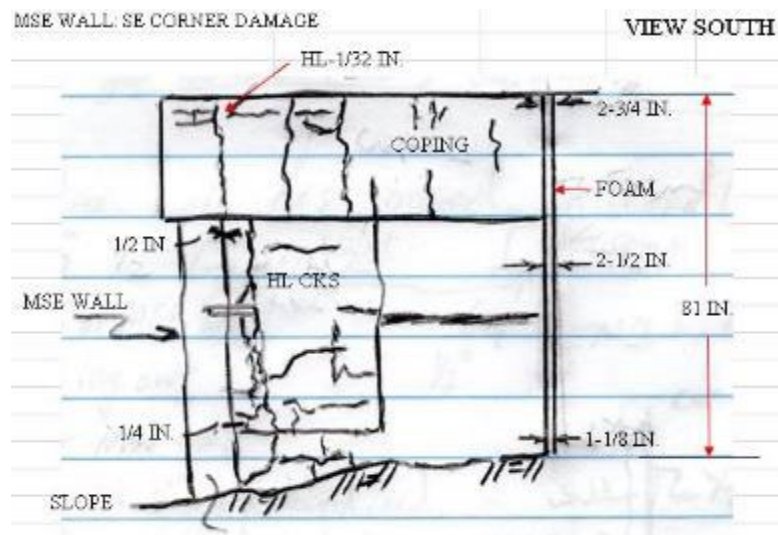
Map of Lateral Displacement Damage at North End of South MSE Wall, Bitch Creek Bridge
